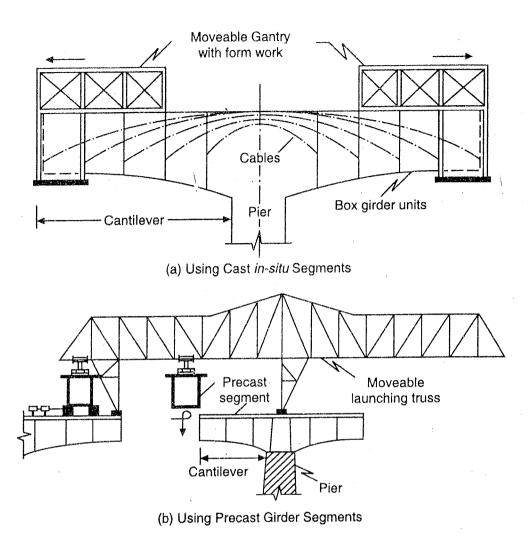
Cantileve: Method of Construction of Prestressed Concrete Bridges.
